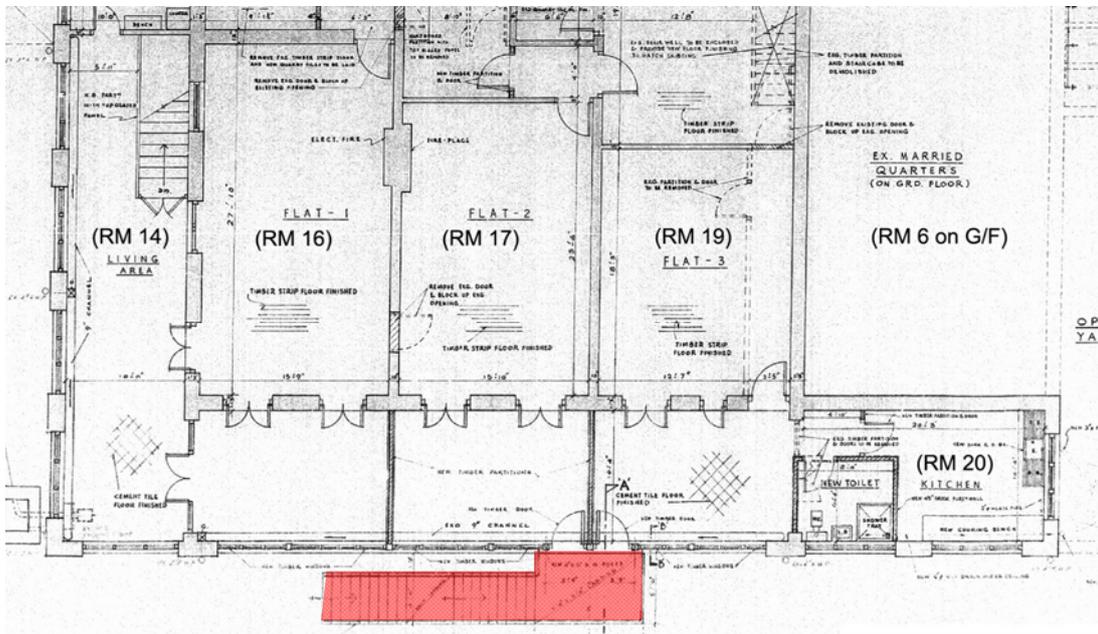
Extracted first floor plan at the main building for the proposed conversion to staff quarters at the Government Stores in 1969.
